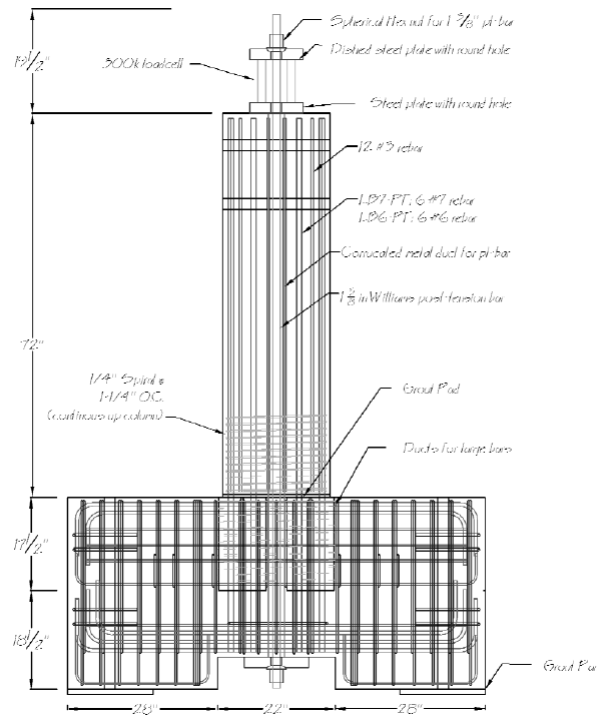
Specimens PosT-CB-LOPT and PosT-CB-HIPT elevation (Cohagen et al. 2008)
